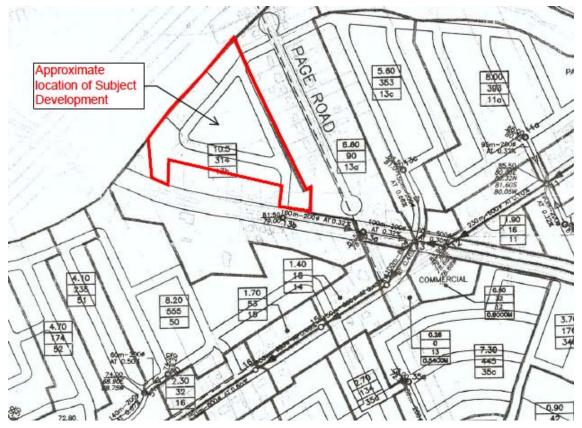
Location of Subject Lands on Stantec EUC Sanitary Drainage Area Plan
